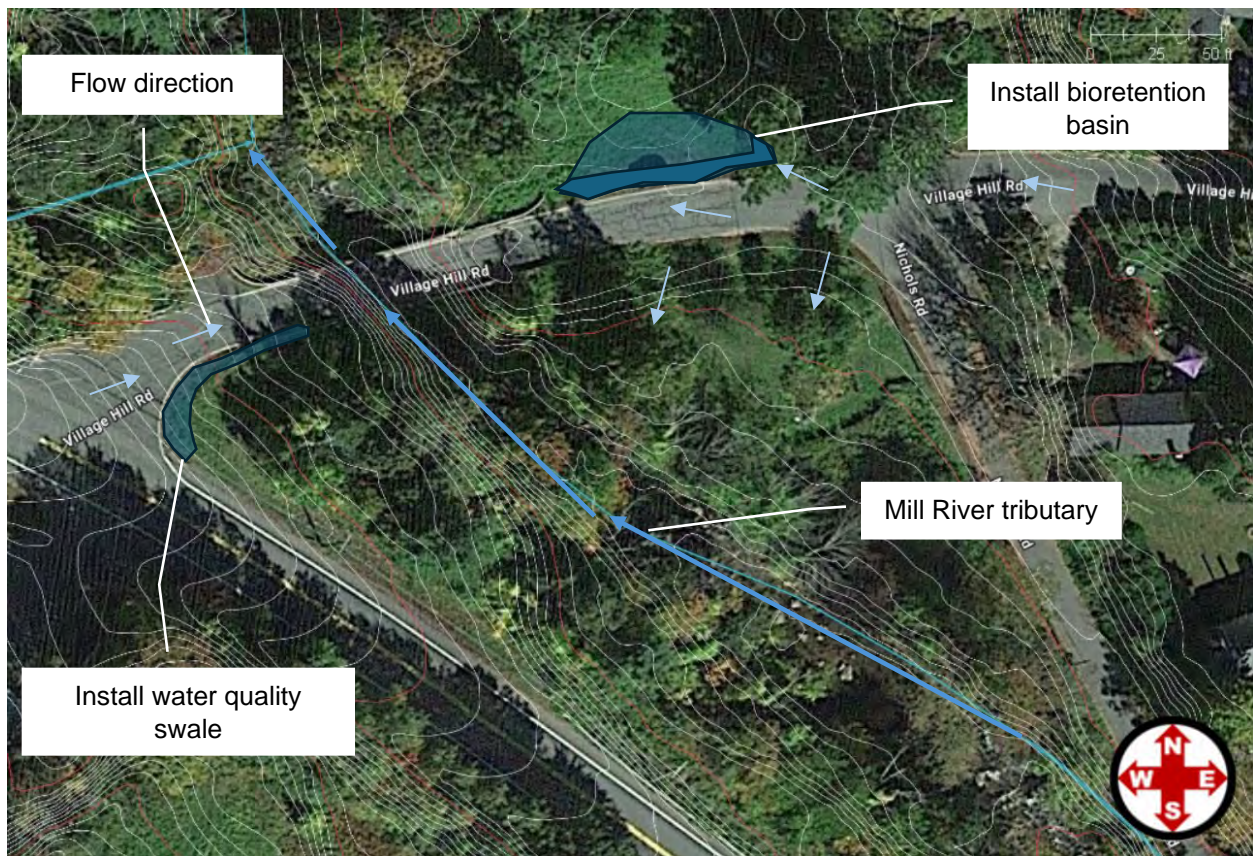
Topography at Village Hill Road and proposed bioretention basin and swale
